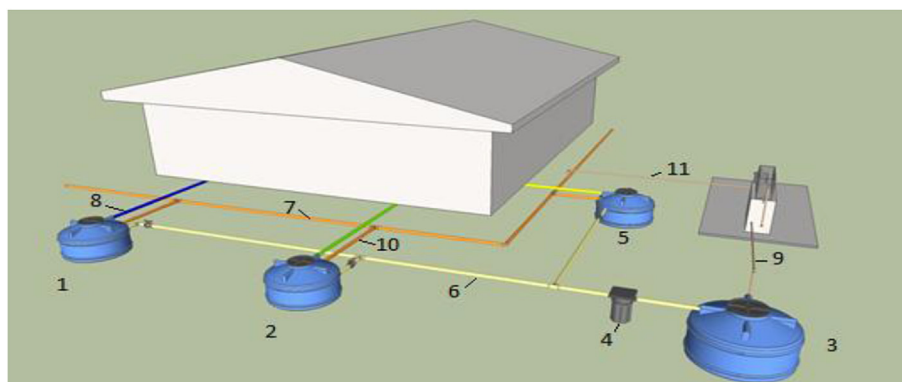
Pilot greywater treatment system. 1,2,5-tanks for segregated greywater collection (washing machine, showers and washbasins); 4-pretreatment; 3-equalization tank; 6-pipe connections; 7-sewer; 8-pipe collecting greywater from washing machine; 9-greywater from equalization tank being pumped to MBBR reactor; 10-overflow pipe of collected greywater to the sewer network; 11-collecting pipe of treated greywater.
